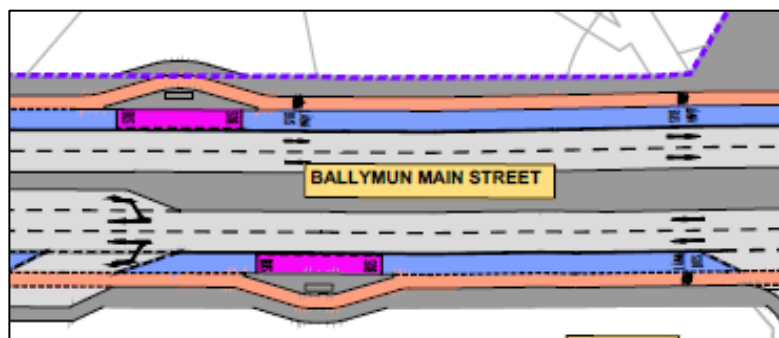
EPR (Option A) Plan layout on Ballymun Main Street
